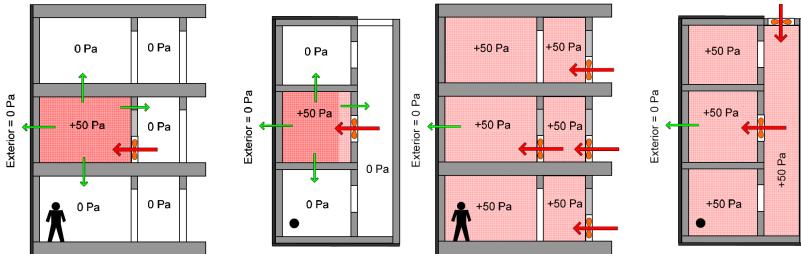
Single zone test with adjacent zones open to exterior (two left figures: section and plan view of test floor) and guarded zone test with adjacent zones pressurised (right figures) [9]
